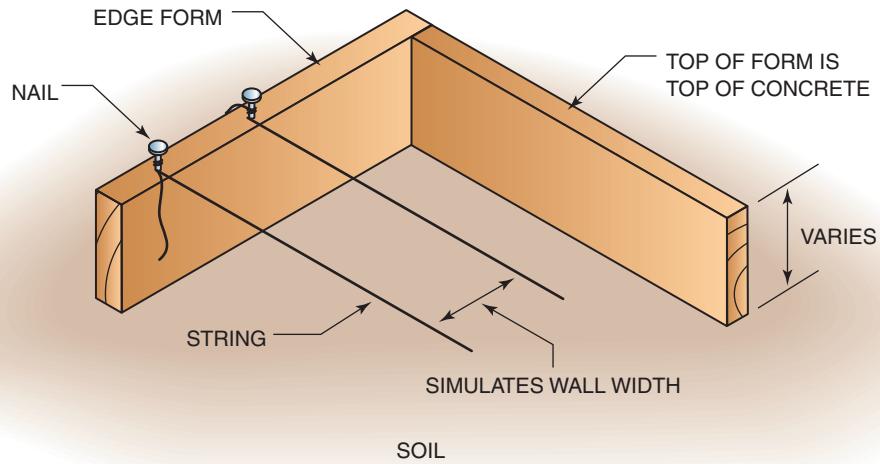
A wooden edge form creates an outline of a building constructed on a concrete slab.
